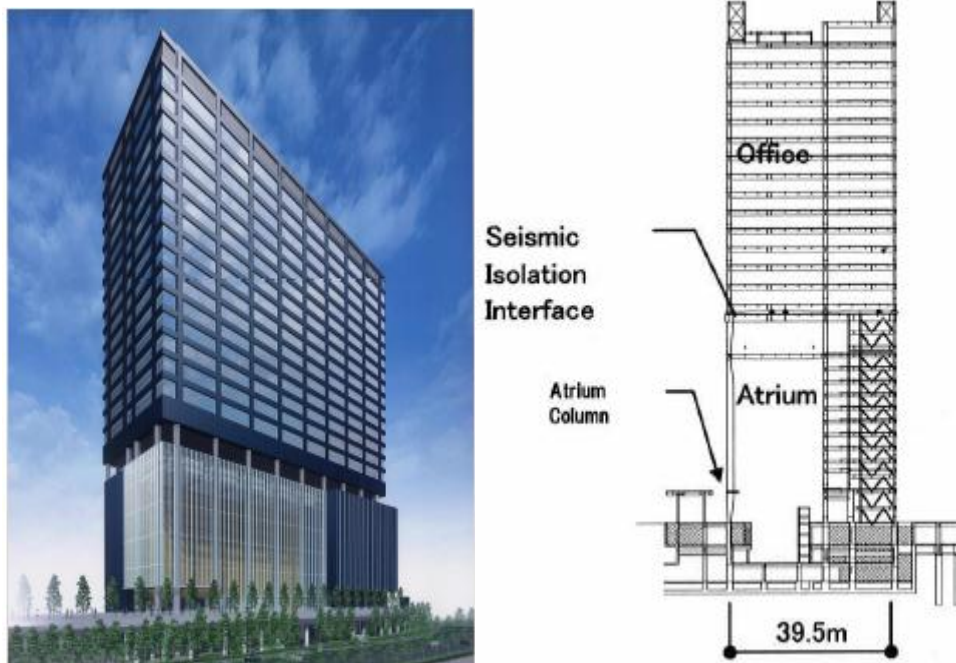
A 3D view of Shiodome Sumitomo building and framing elevation (Sueoka et al 2004)
